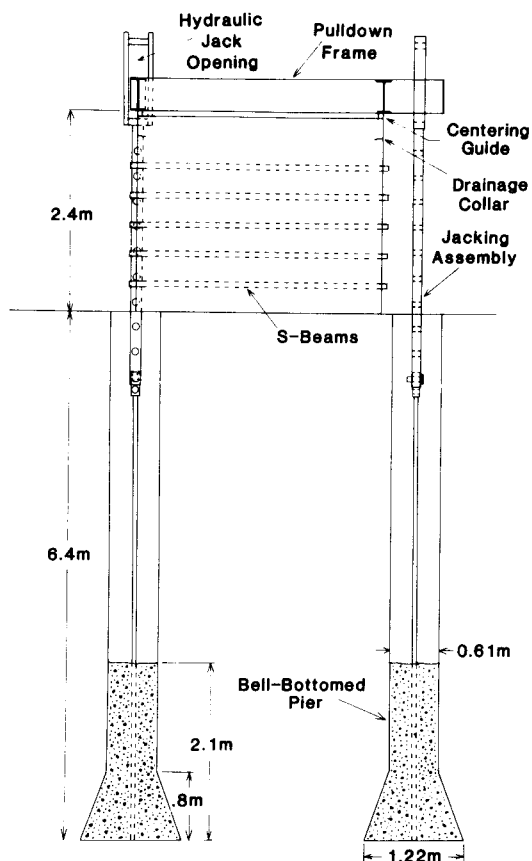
Section (A-A in Fig. 1) of soil monolith container and hydraulic pull-down equipment.
